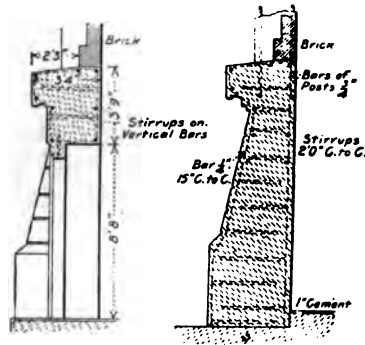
Vertical Section of Base of Fort Revere Water Tower.
